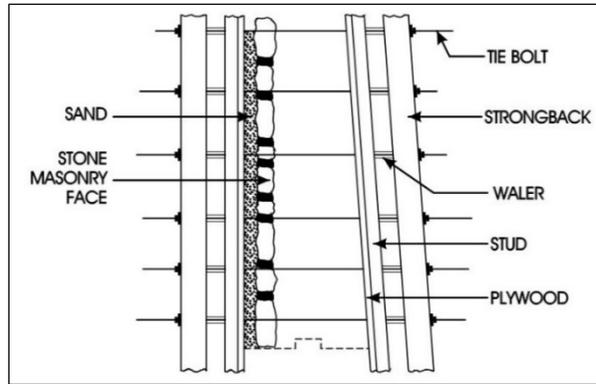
40: Sand Method of Securing Stone Masonry Faces for Concrete Placement
